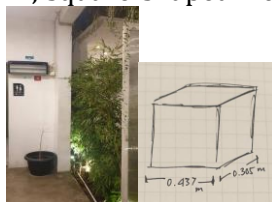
and 15 Reinforced concrete Column, Square-shaped in Senja Coffee and Memories
